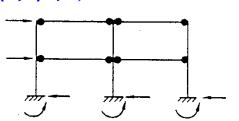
Dual building, ductile yielding of partially debonded bars between foundation and shear wall boundary elements.
